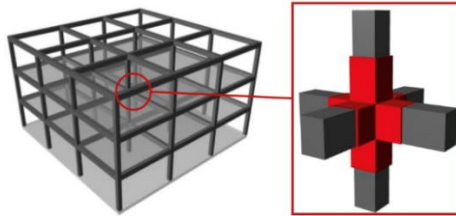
Example of Local strengthening of existing RC frame joints. From [67].
